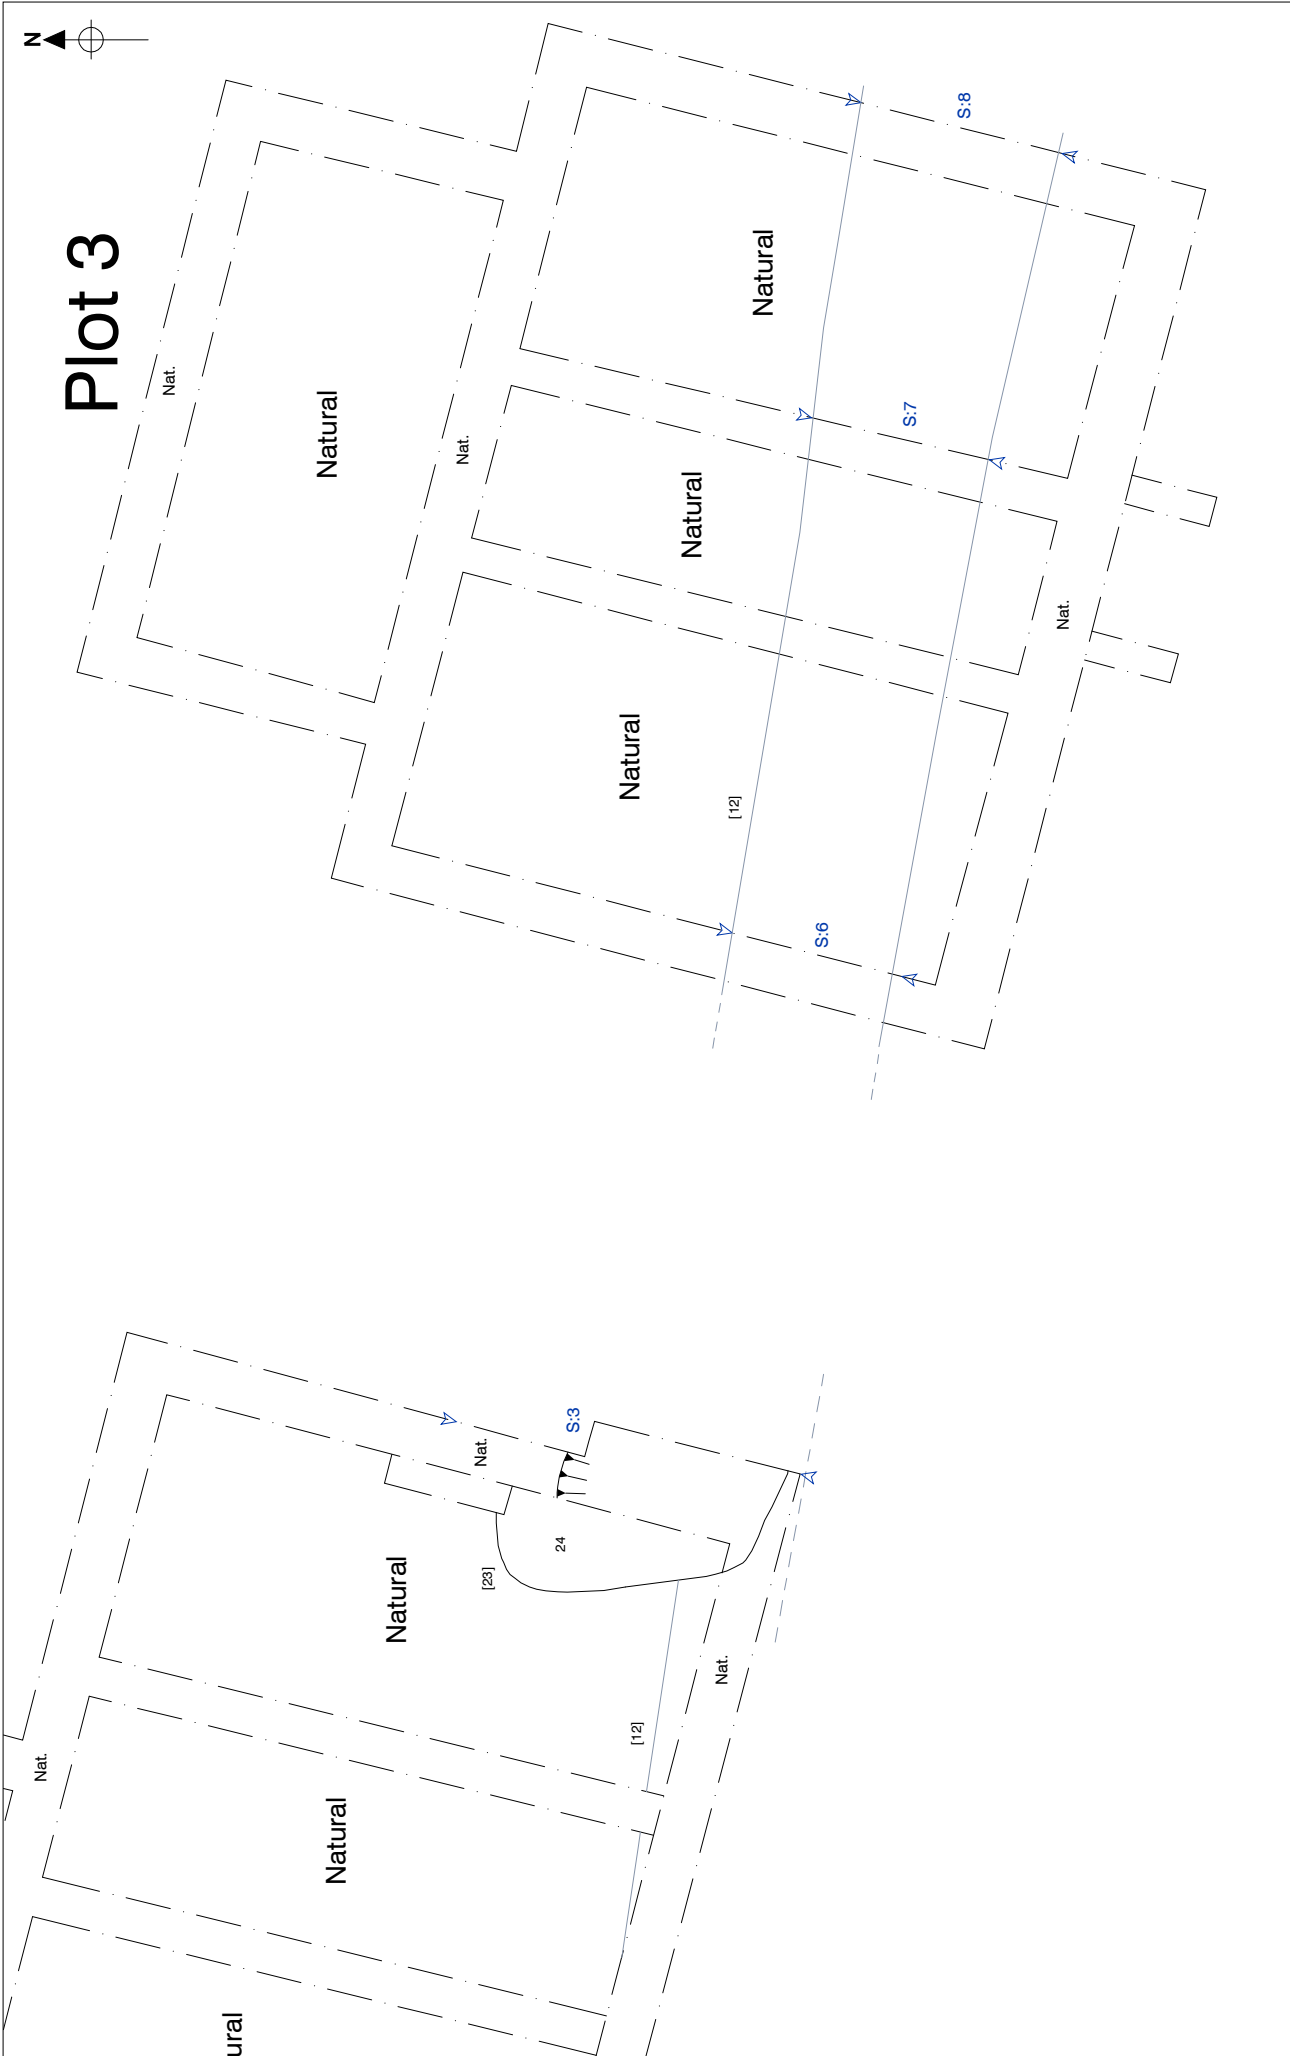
Plots 2 & 3 - House footing trenches. Scale 1:100
